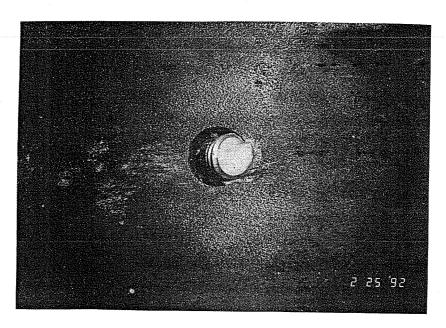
Anchor failure by kinking after bending in double curvature - Test CN3h-WN (viewed from bottom of steel section)
